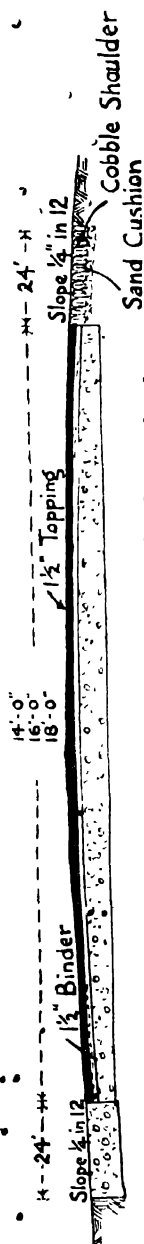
Old Concrete Road Widened and Re-surfaced.
